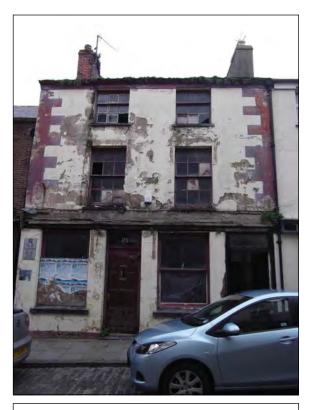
21 High Street Front Elevation Prior to Commencement of Work. Photograph Supplied by Client
